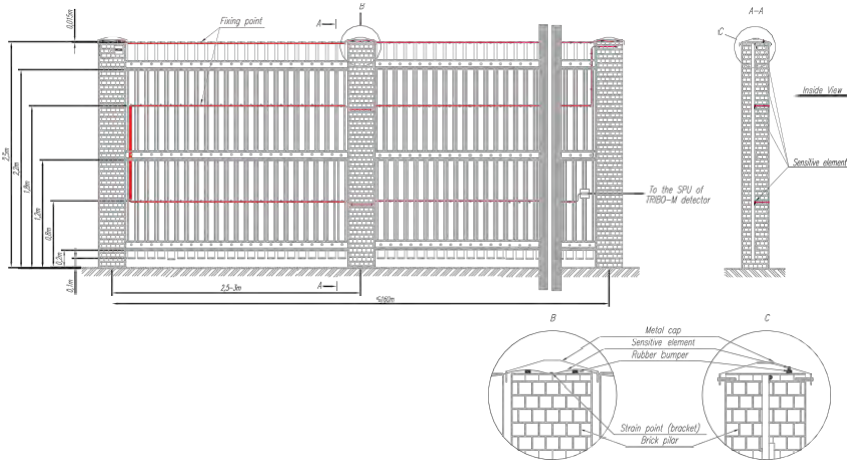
SENSITIVE ELEMENT LAYOUT WOODEN FENCE WITH BRICK PILLARS
